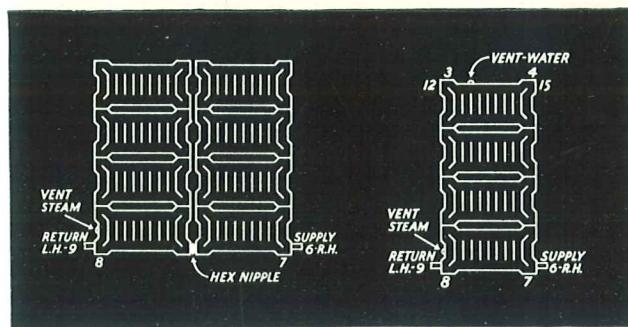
Assembled in two or more stacks. One and two pipe steam only. Bottom feed.
